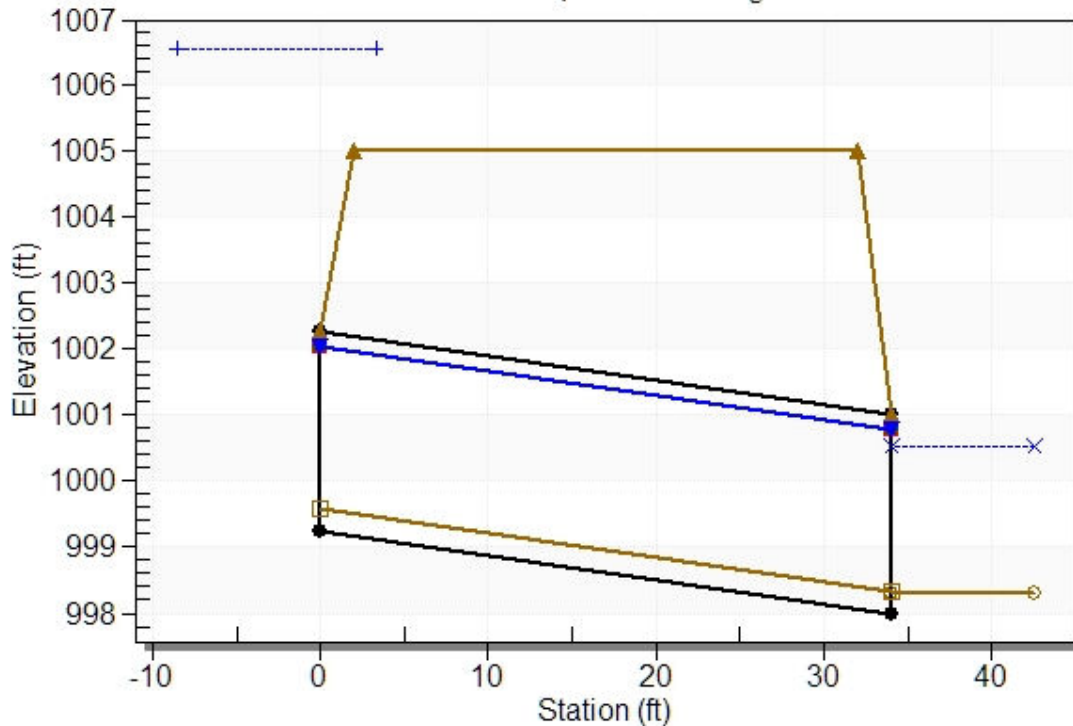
Water Surface Profile Plot for Culvert: Culvert 36" Double
